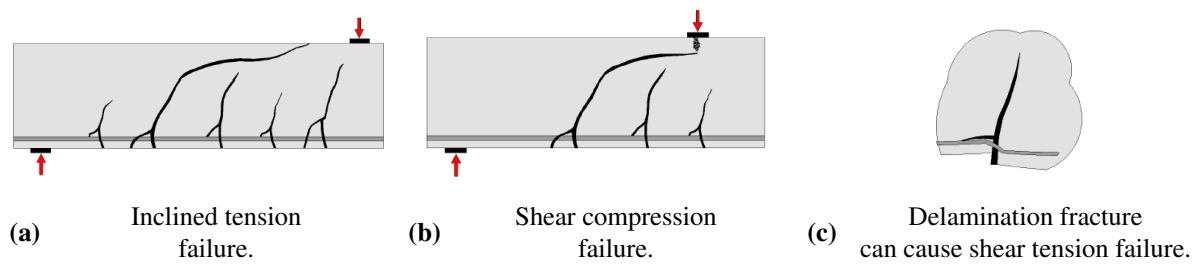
Types of shear failure in beams without transverse reinforcement. [18]
